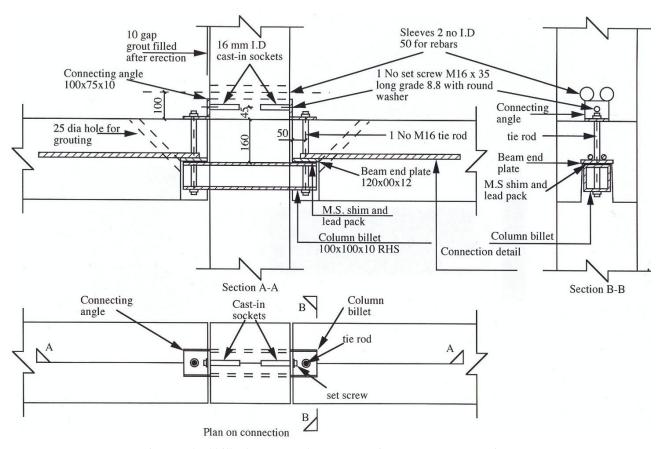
Bolted billet beam-to-column connection (two way connection)
